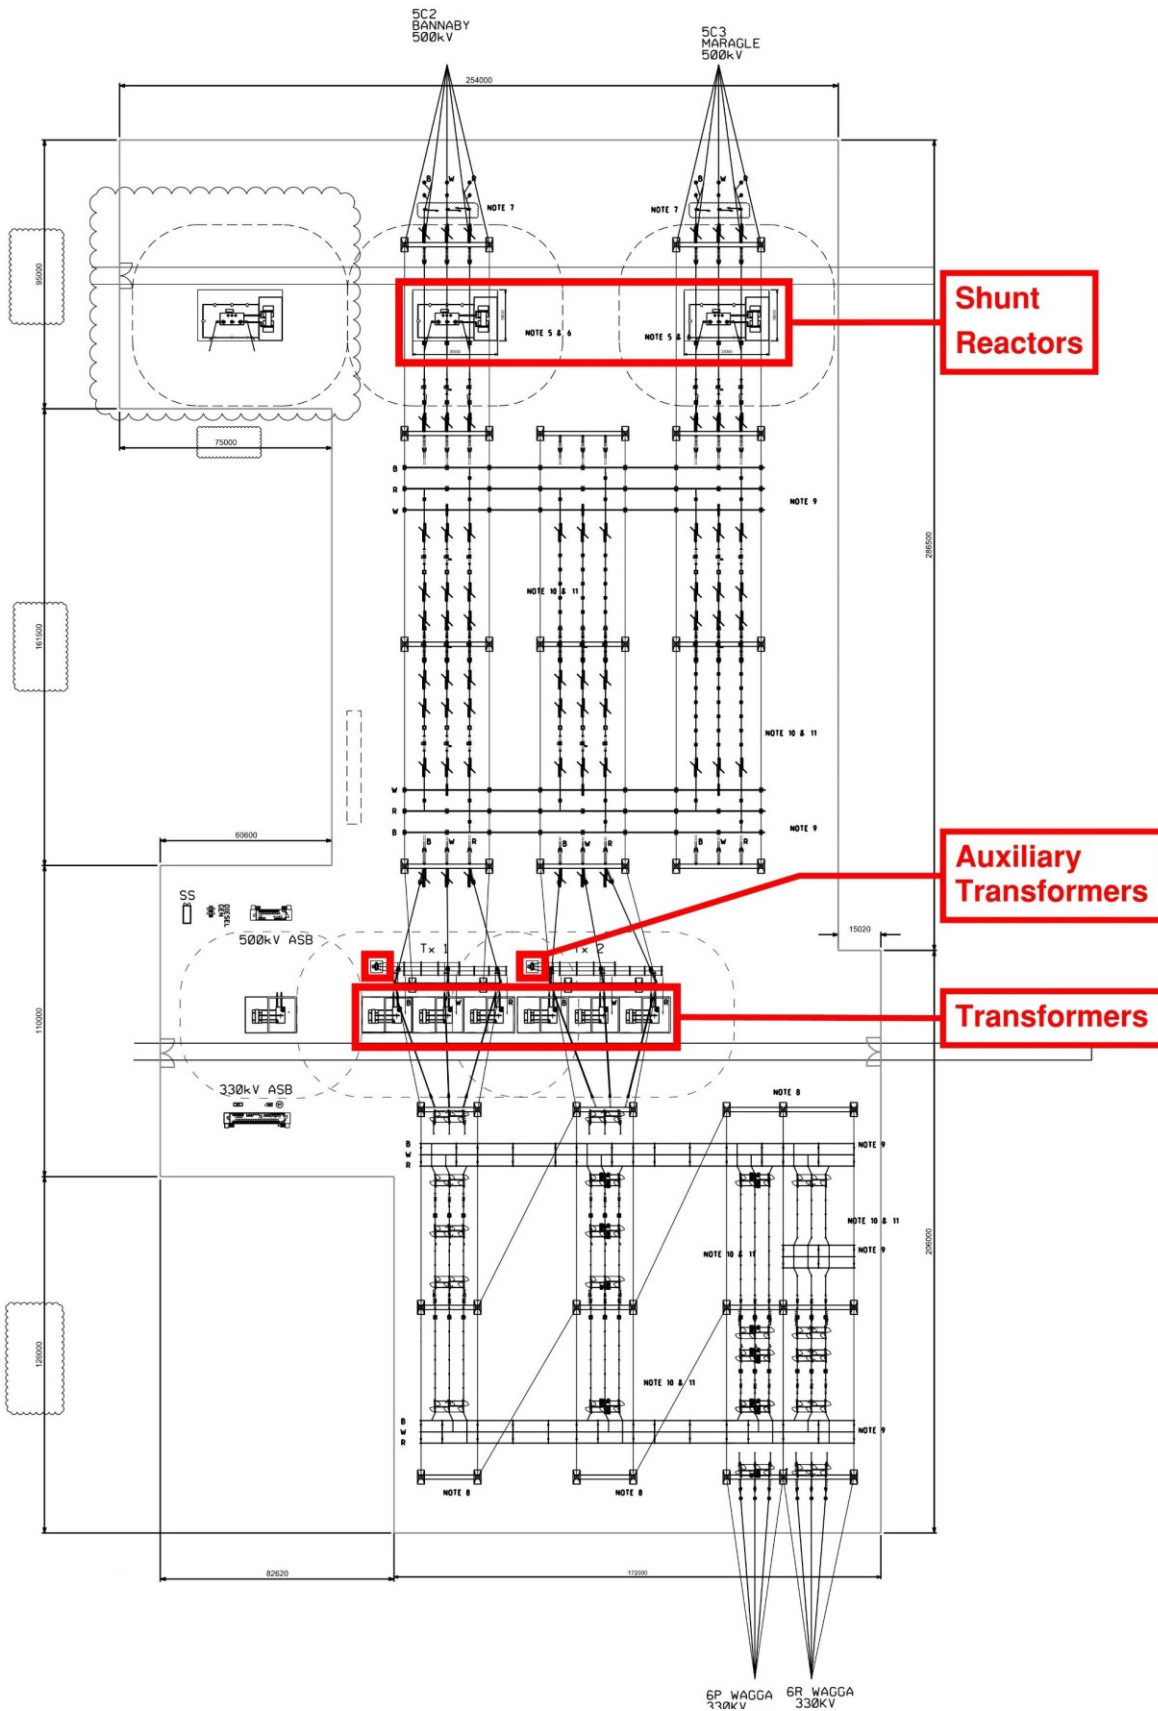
Indicative layout of the proposed Gugaa 500 kV substation layout
